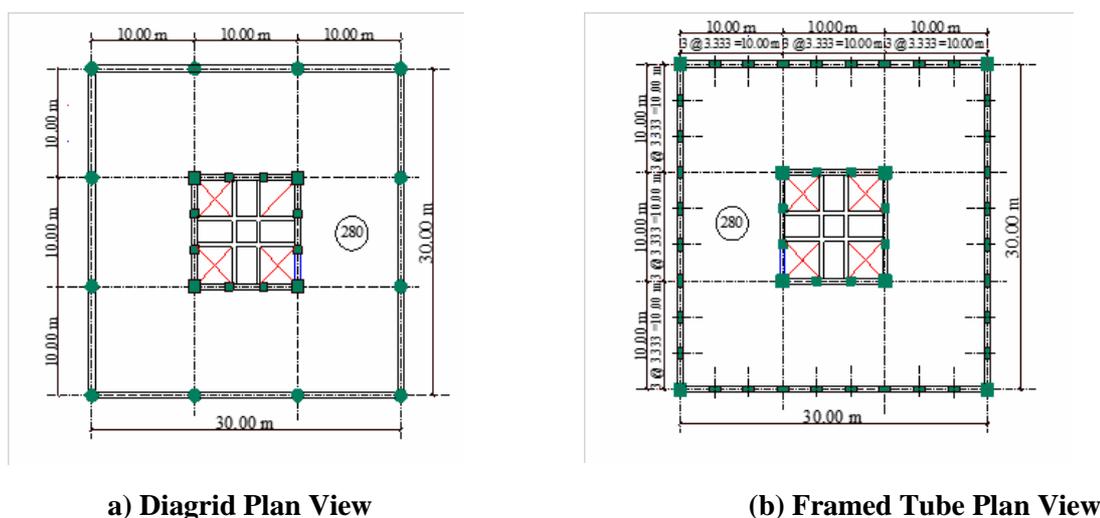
Plan View of Diagrid and Framed Tube Buildings
